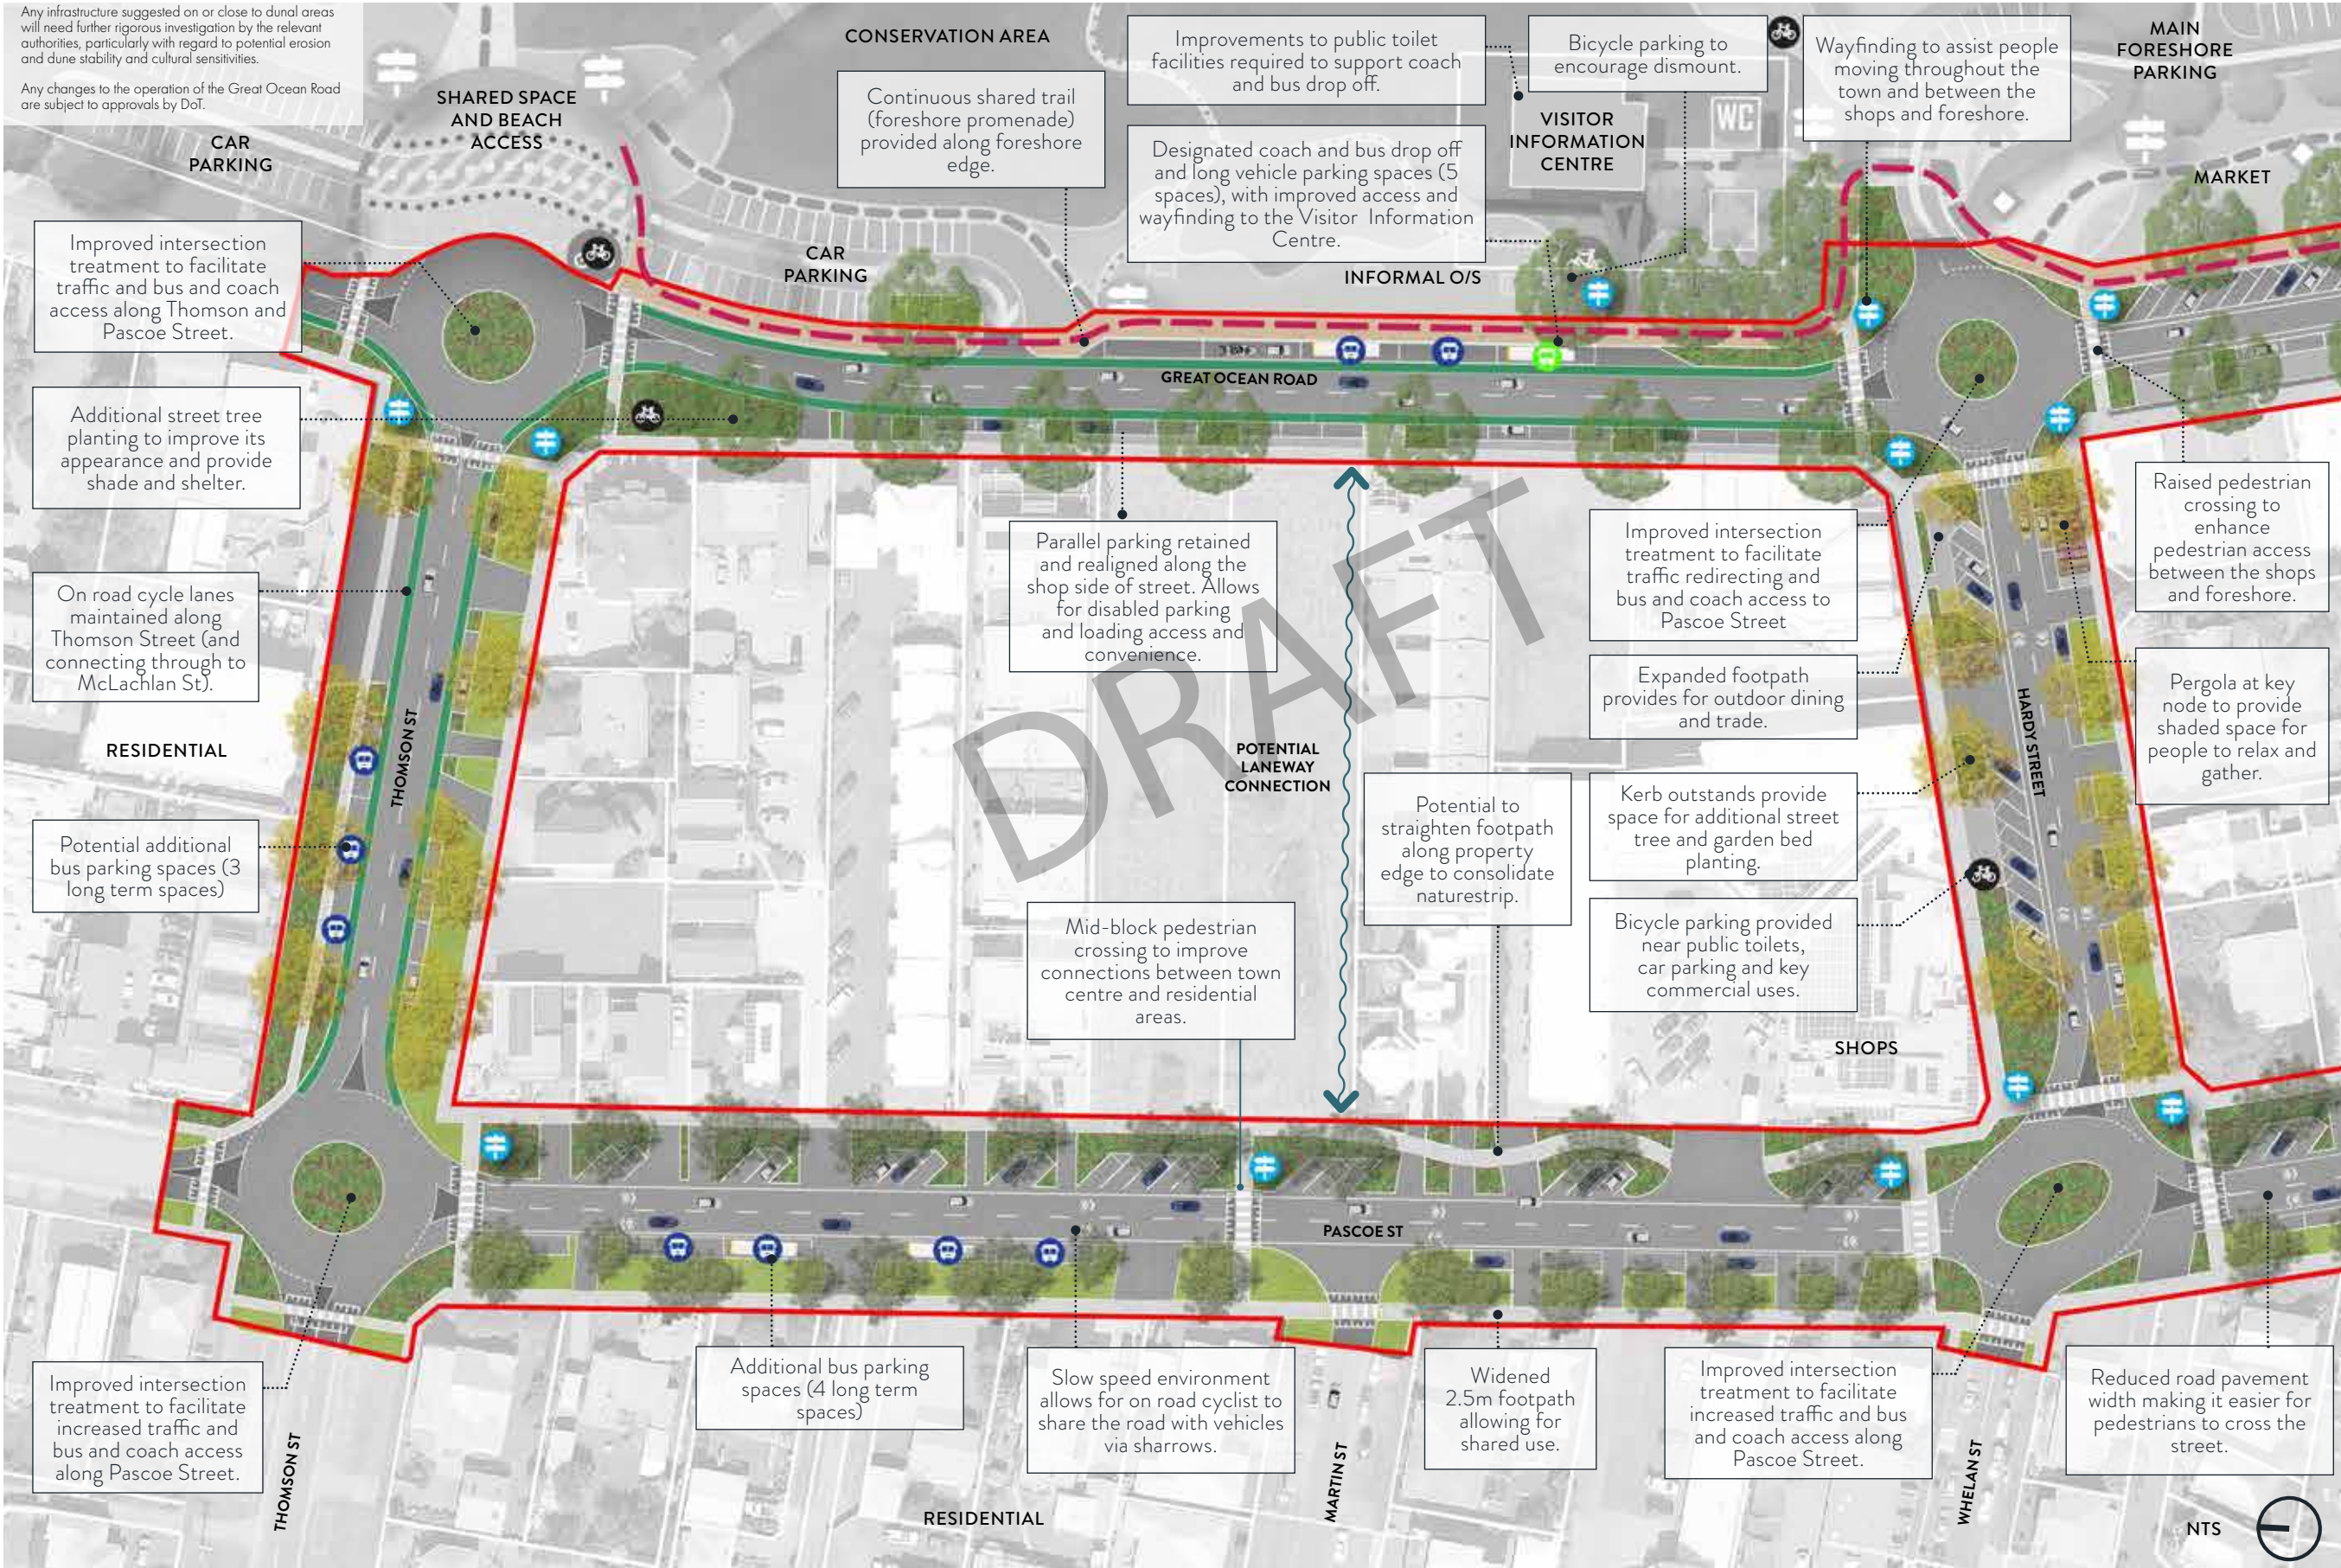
Detailed Streetscape Plan 1 - Option 1 - One-Way
